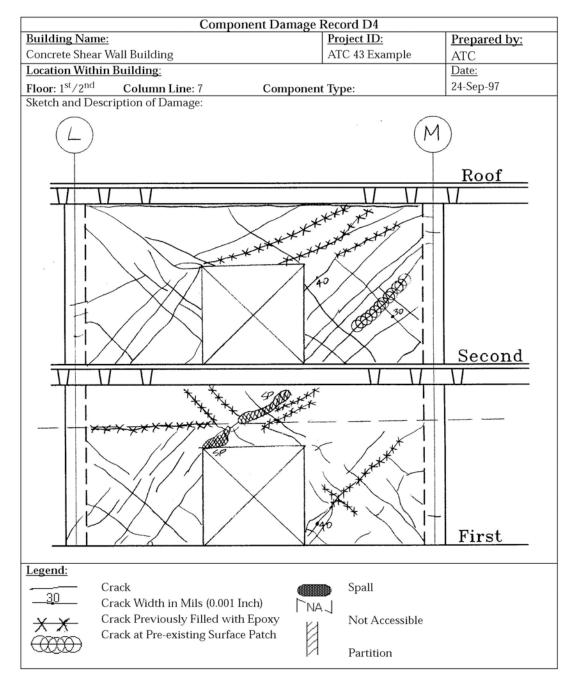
Sample of a "Component Damage Record" form from *FEMA 307*, indicating one recommended method of how to record cracks, spalls, previous work, and similar conditions.
